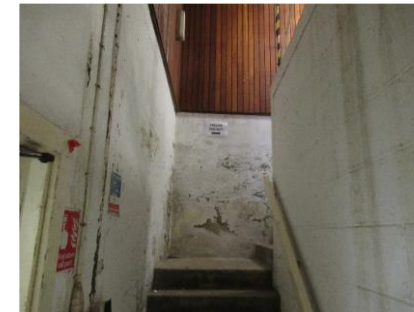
Water damage to right side basement stair in the main Kneller Hall west wing building (Photo taken from Jones Lang LaSalle IP, Condition Survey Report - Kneller Hall Guard House, 2020)
